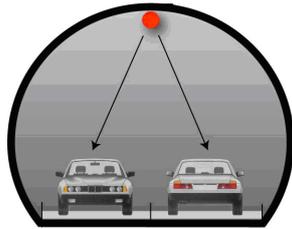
Tunnel with a width < 10 m and one sensor cable
